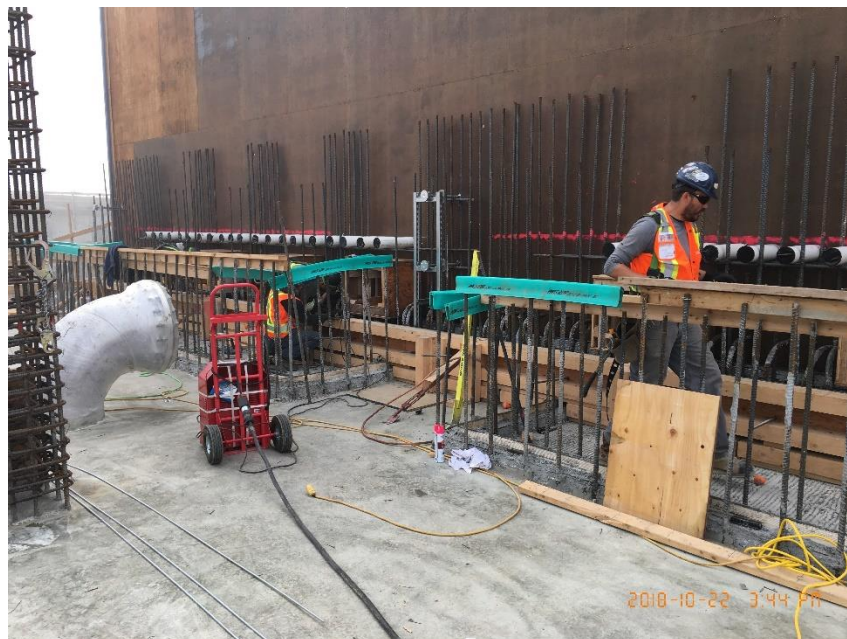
McLoughlin Point Wastewater Treatment Plant: Installing mechanical penetrations in biological aerated filter (BAF) wall 13.
